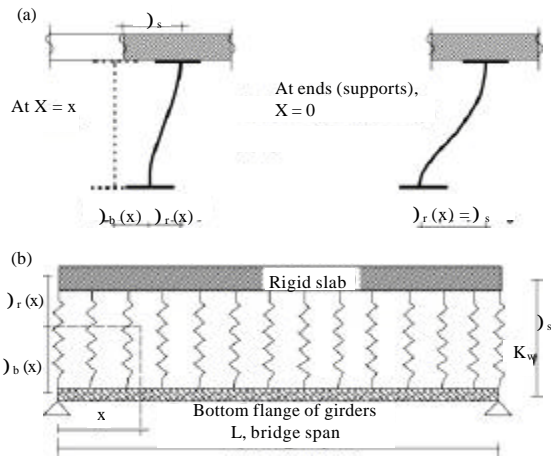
(a-b): (a) Side view of beam deformation and (b) Rigid slab on the elastic foundation (Zahrai and Bruneau, 1998)
